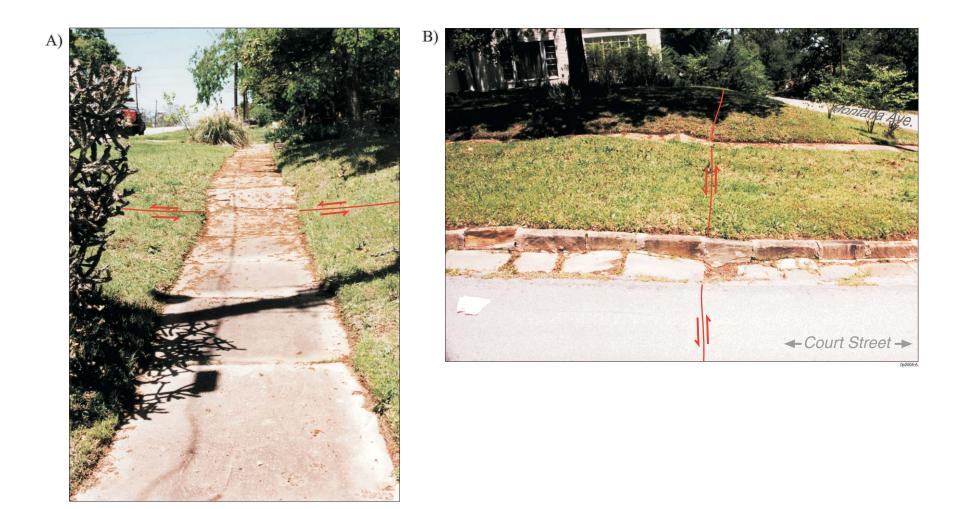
Photographs of sidewalk and curb deformation at corner of Court Street and Montana Avenue. A) Lookingwest northwest along sidewalk on Court Street, Showing left lateral offset and Down-to-the-west displacement. B) looking north-northeast at scarp in sidewalk and deformation in stone curb along Court Street.
